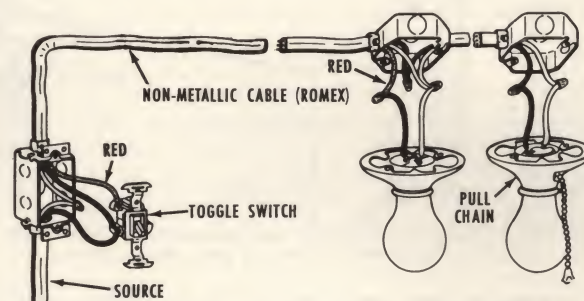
TWO FIXTURES INSTALLED ON SAME LINE
